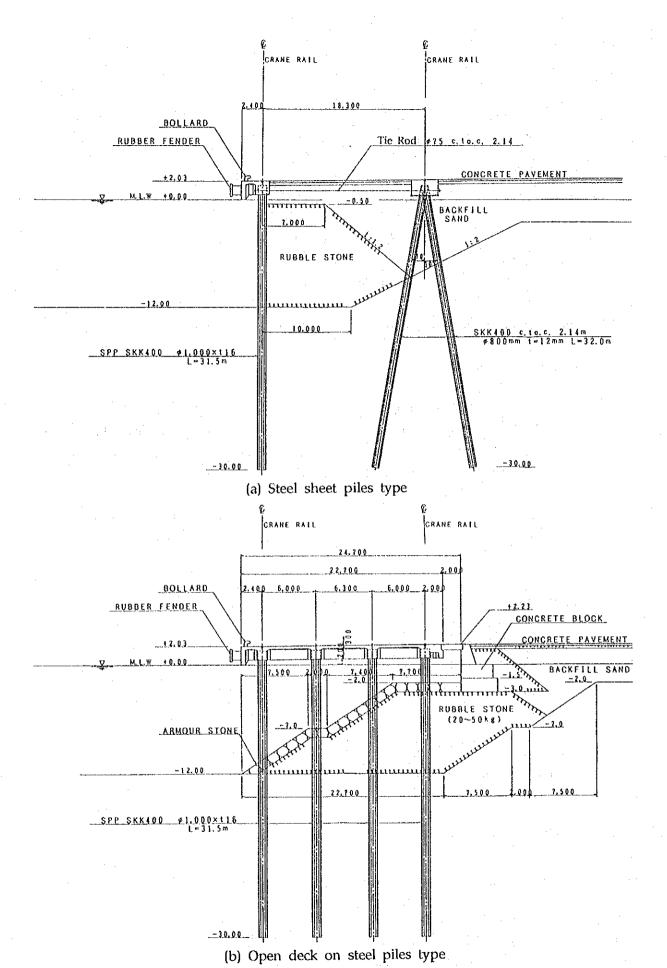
Typical Cross Section (Scale: 1: 400)
